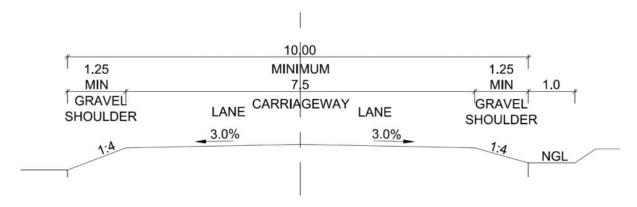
Proposed Typical Cross-section, (Shashi consulting Engineers)
